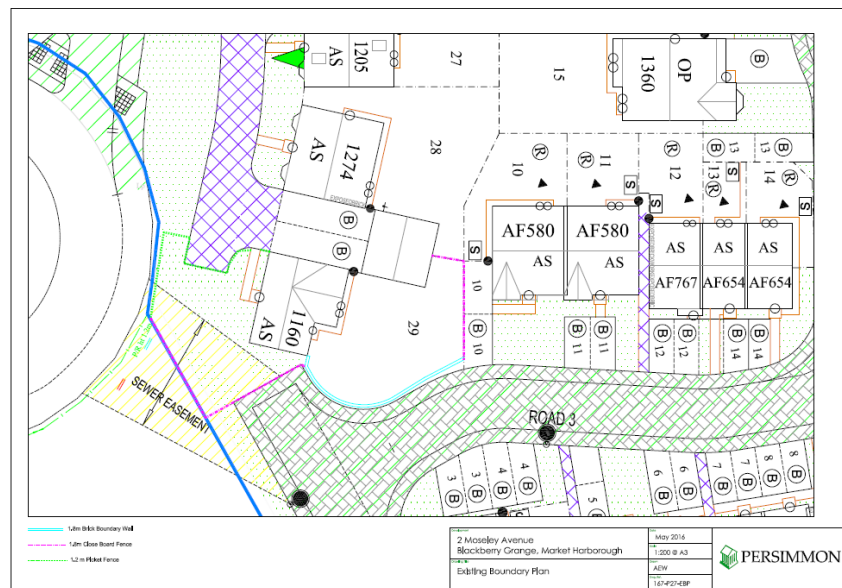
Plan Showing Areas of Additional Land Incorporated into the Domestic Curtilage
